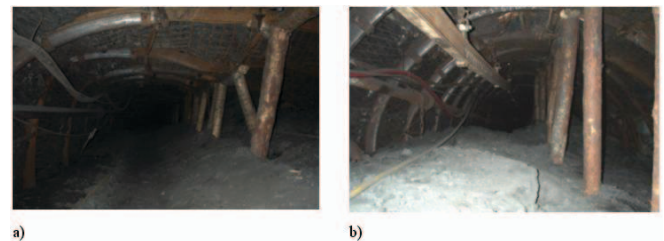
Examples of gateroad deformation (a) deformation of roof-bar arches due to roof sag and (b) heave of floor strata.
